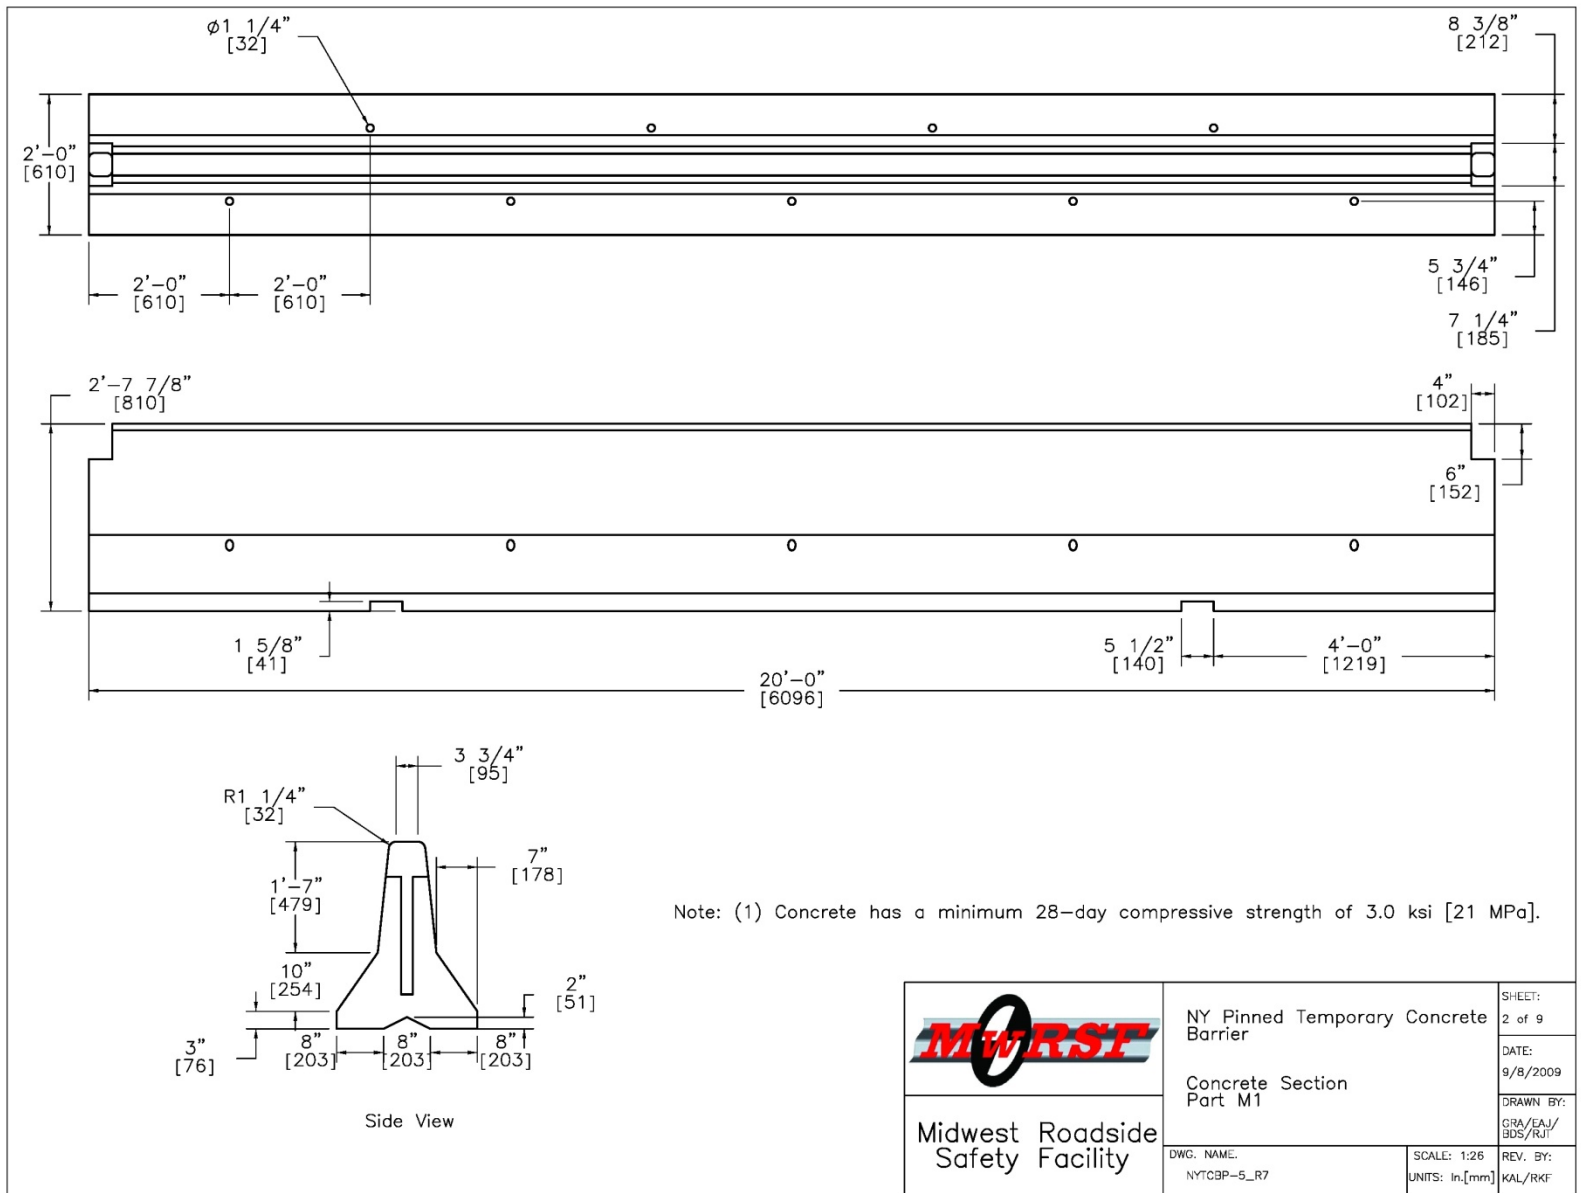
Temporary Concrete Barrier Details, Test No. NYTCB-5
